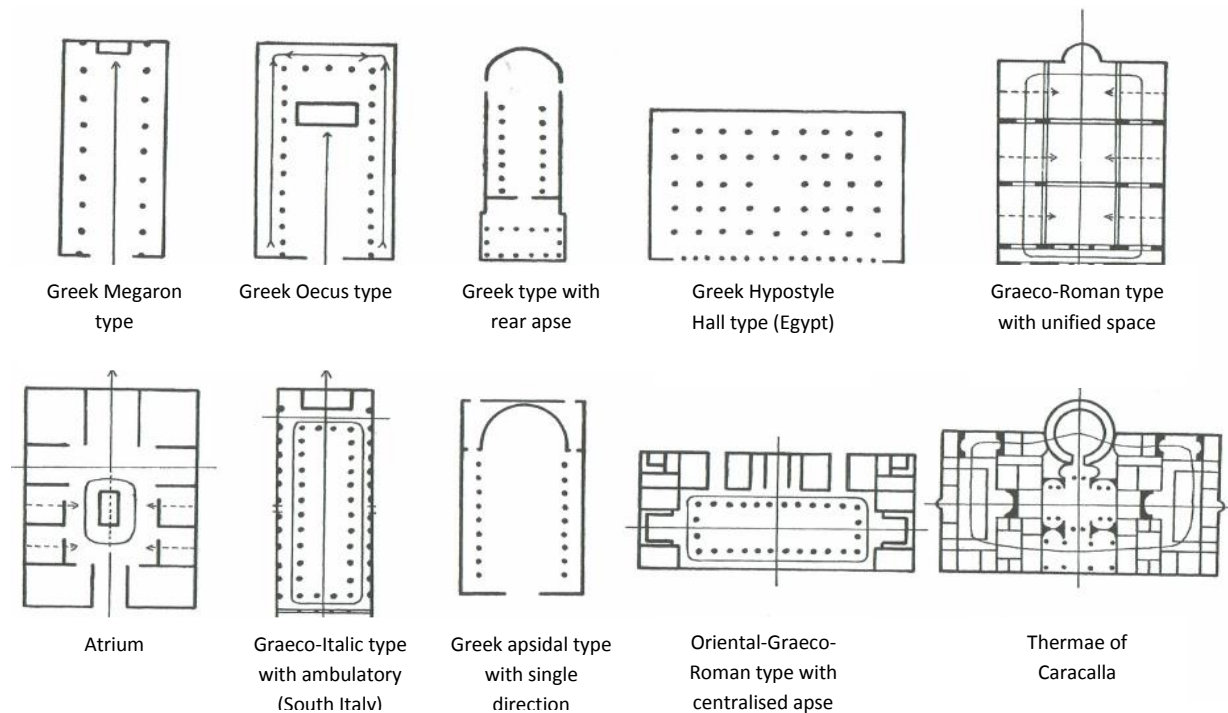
Plans of Basilicas and related buildings (after Müller 1937, 251)
